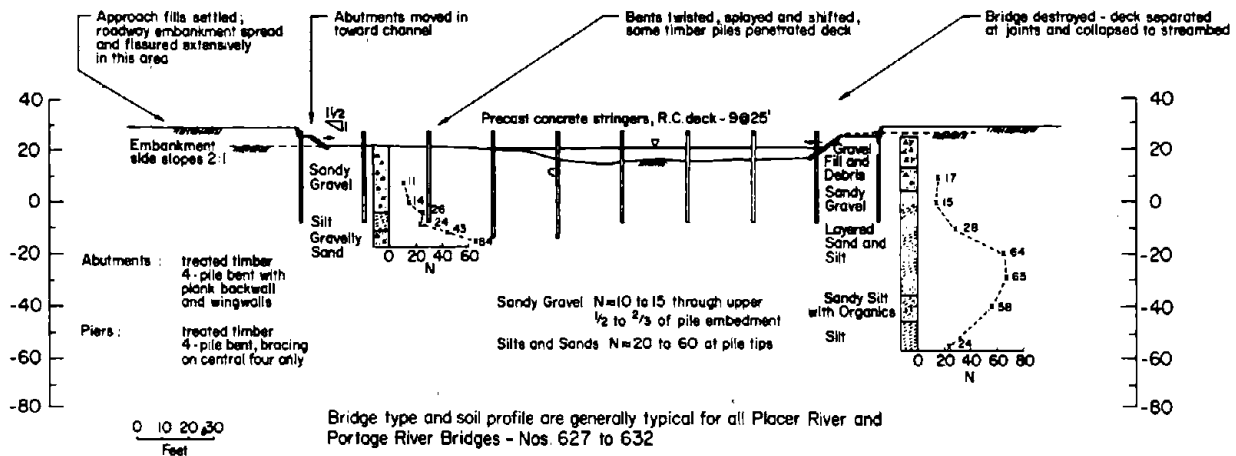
Bridge 631: Portage Creek (centerline section looking downstream - natural scale).
